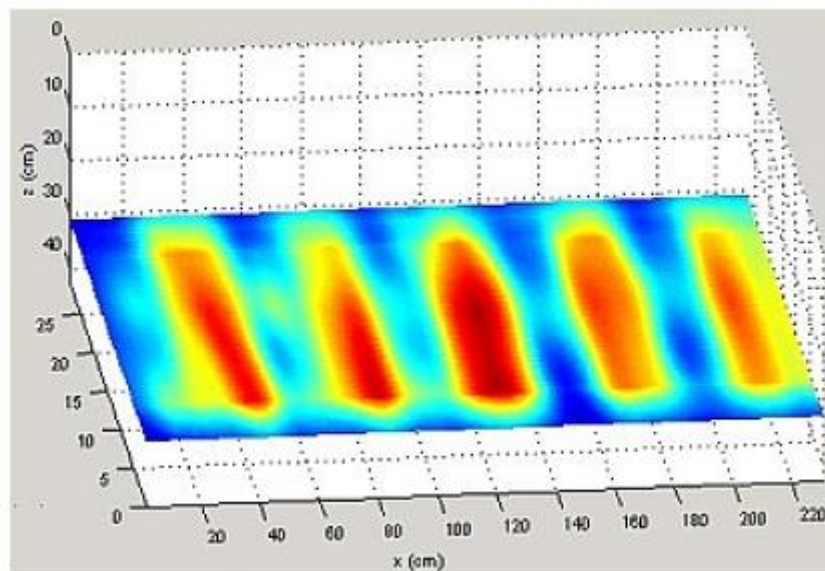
Location of Beams Found Through the Use of Ground Penetrating Radar (Hasenstab, 2006).
